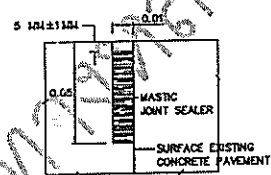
DETAIL OF SAWED JOINT FOR TRANSVERSE JOINT
